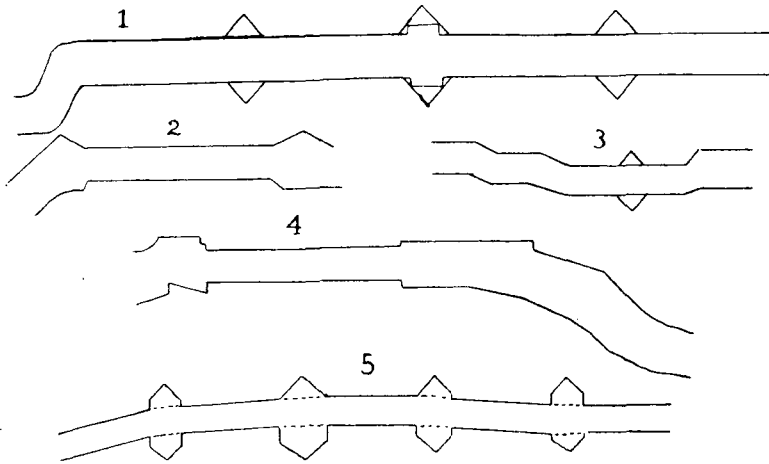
Plans of Bridges with angled approaches on Roadway.
